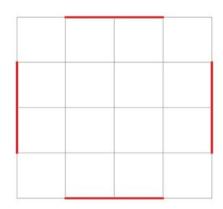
(a) Structural Plan for X- braced RC Frame (Model-2)
